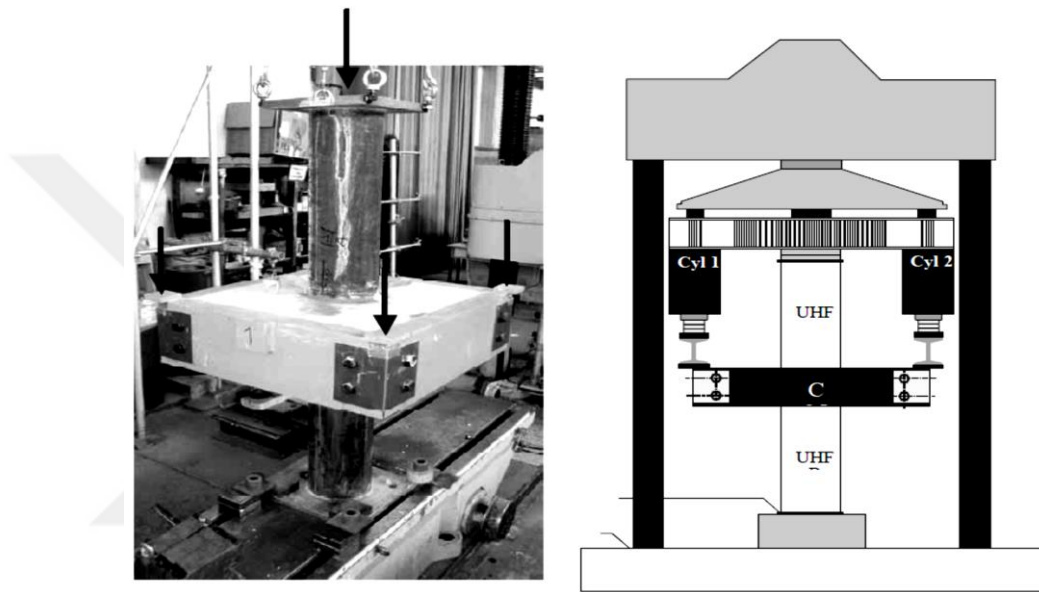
The experimental testing conditions of UHPC filled steel tube joint (Tue et al., 2004)
